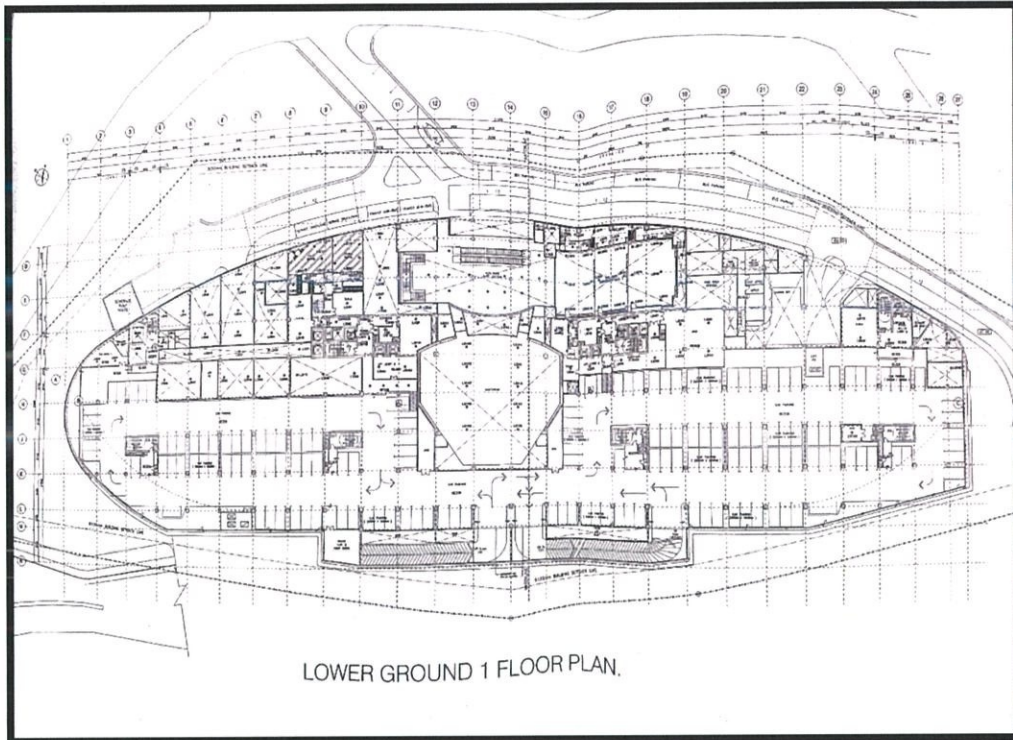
Lower Ground 1 Floor Plan of Bank Negara Malaysia
